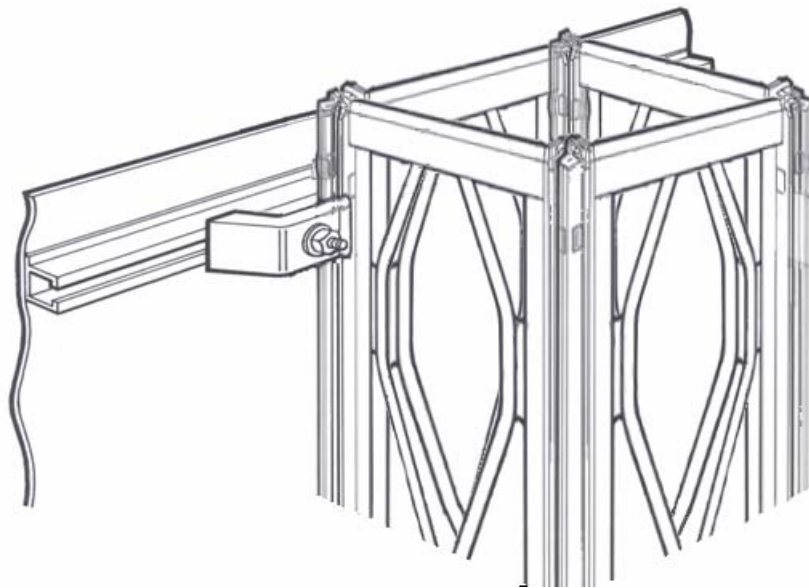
, Showing Mast, Clamp & Sign Channel arrangement
